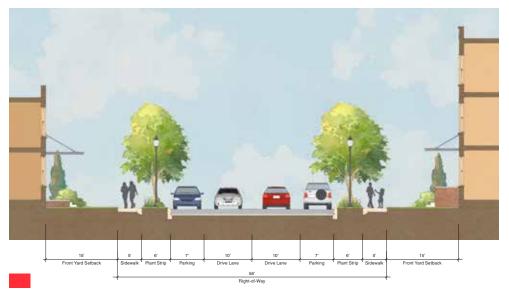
Street Section Proposed Liberty Street with green infrastructure and on-street parking (New 56 ft. R.O.W)
